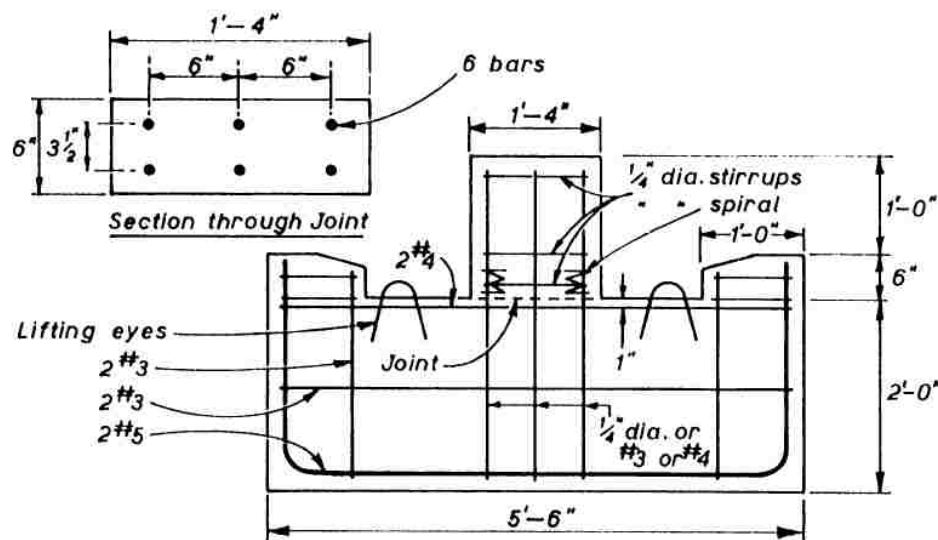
Specimen design (Paulay, Park, and Phillips 1974)
